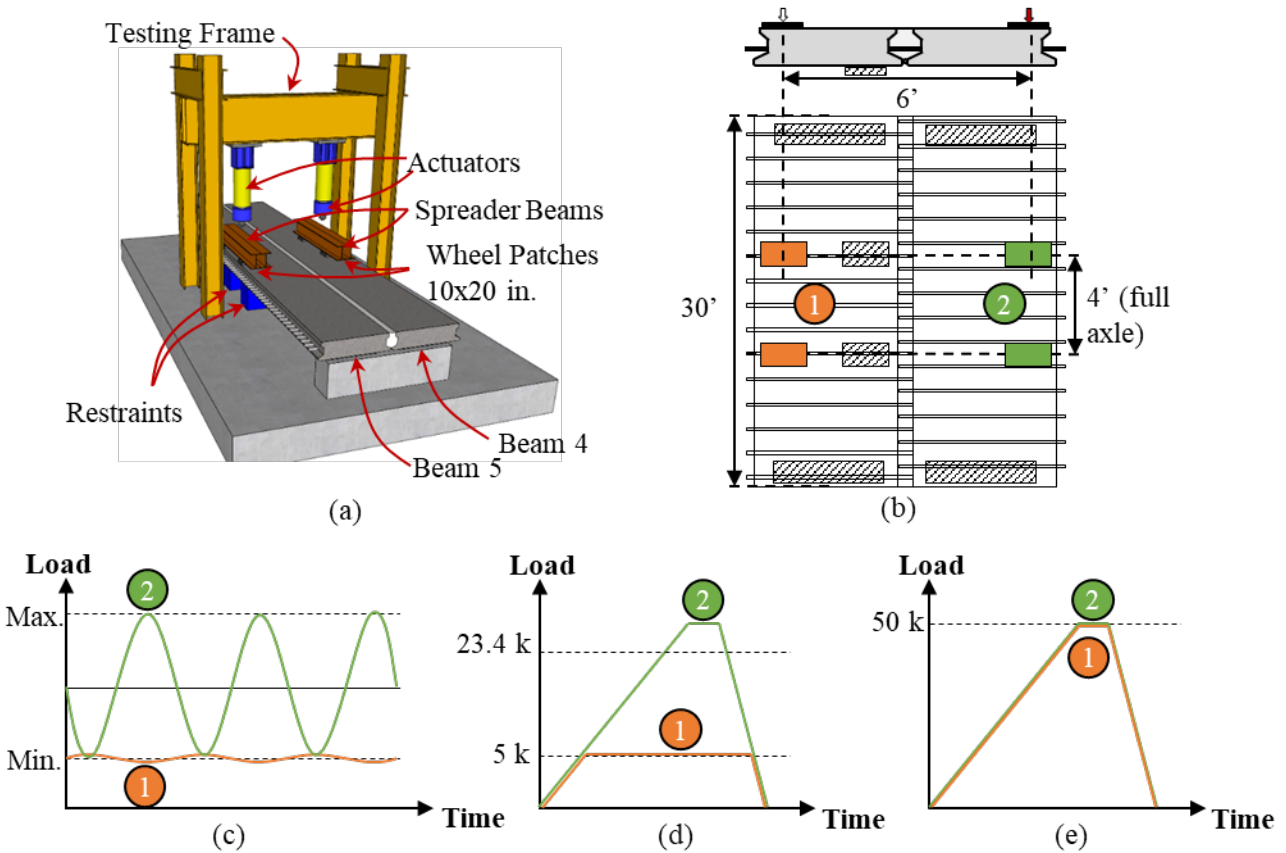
Proposed test setup for Configuration 2-6 (a) schematic and (b) plan and elevation views, (c) reverse sinusoidal load protocol for FC 2-6, (d) static load protocol for FC 2-6, and (e) static longitudinal cracking load protocol for FC 2-6cr
